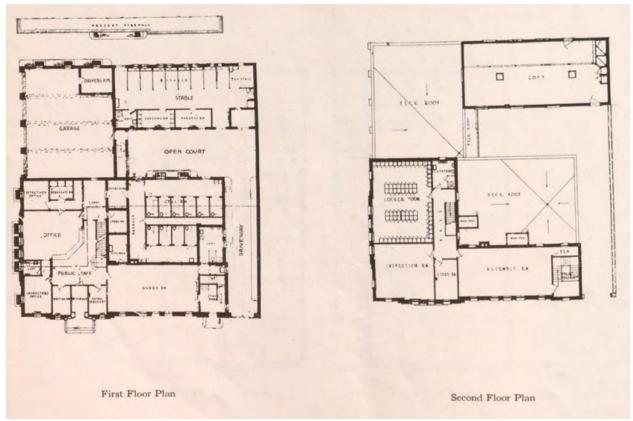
Floor plans for the new Police Station No.6, as published in the October 1932 edition of *Construction* magazine (*Construction*, via City of Toronto Archives).
